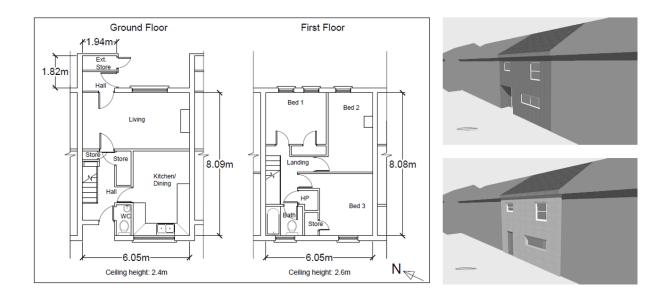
Floor plans and visualisation of Dwelling A before and after retrofit.
